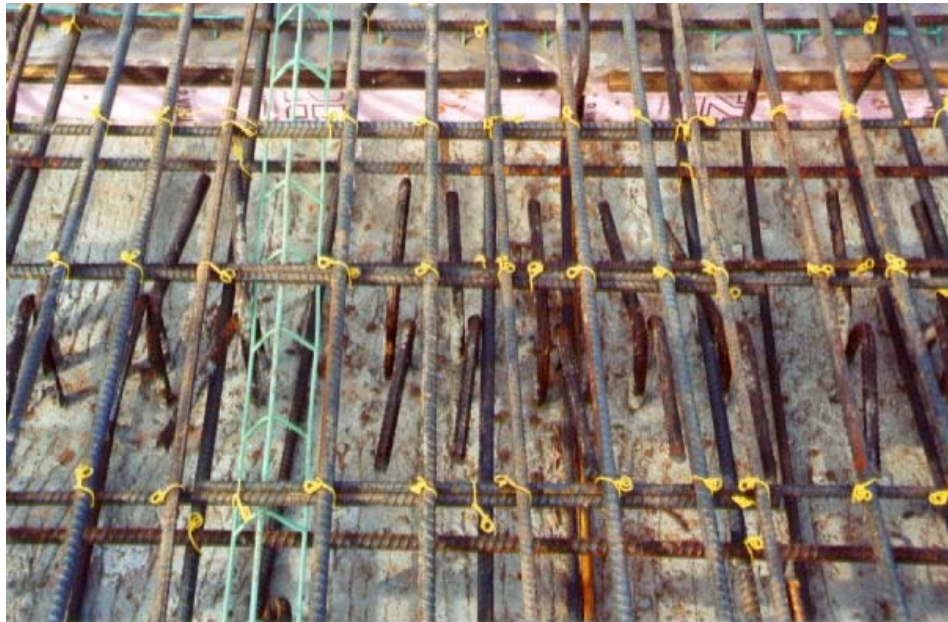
Close-up view of MMFX-II™ deck reinforcing steel.
